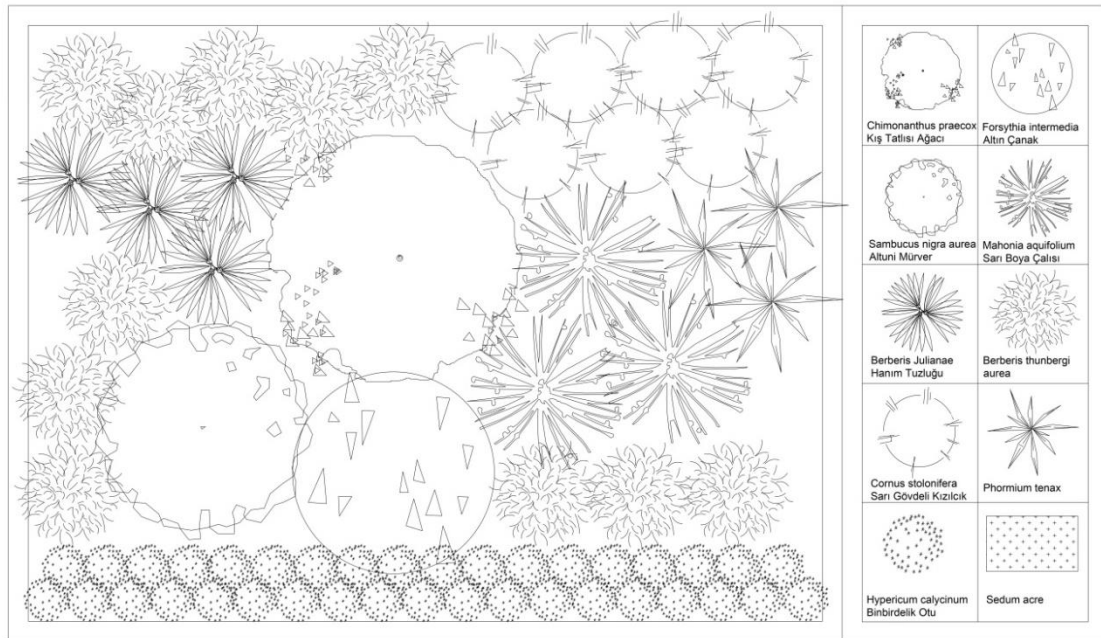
Planting design plan with yellow color effect (Scale: 1/40)
